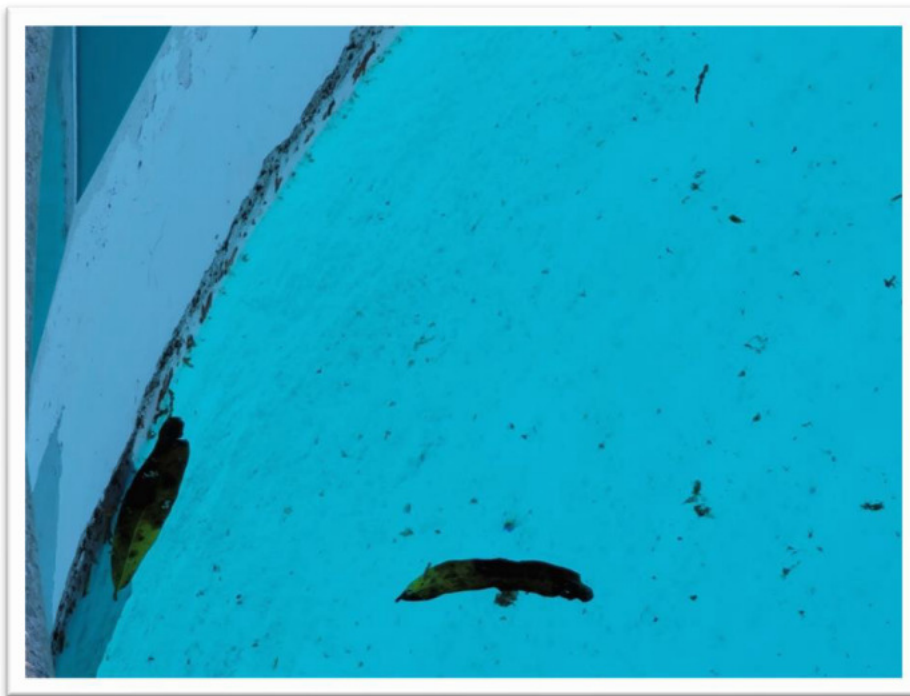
Poor waterline tiles and peeled pool walls.
